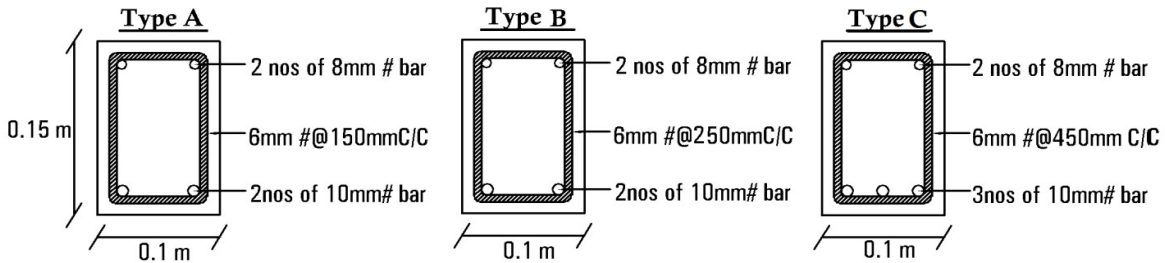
Reinforcement and cross section details of RC beams specimens (Type A, B, C)
